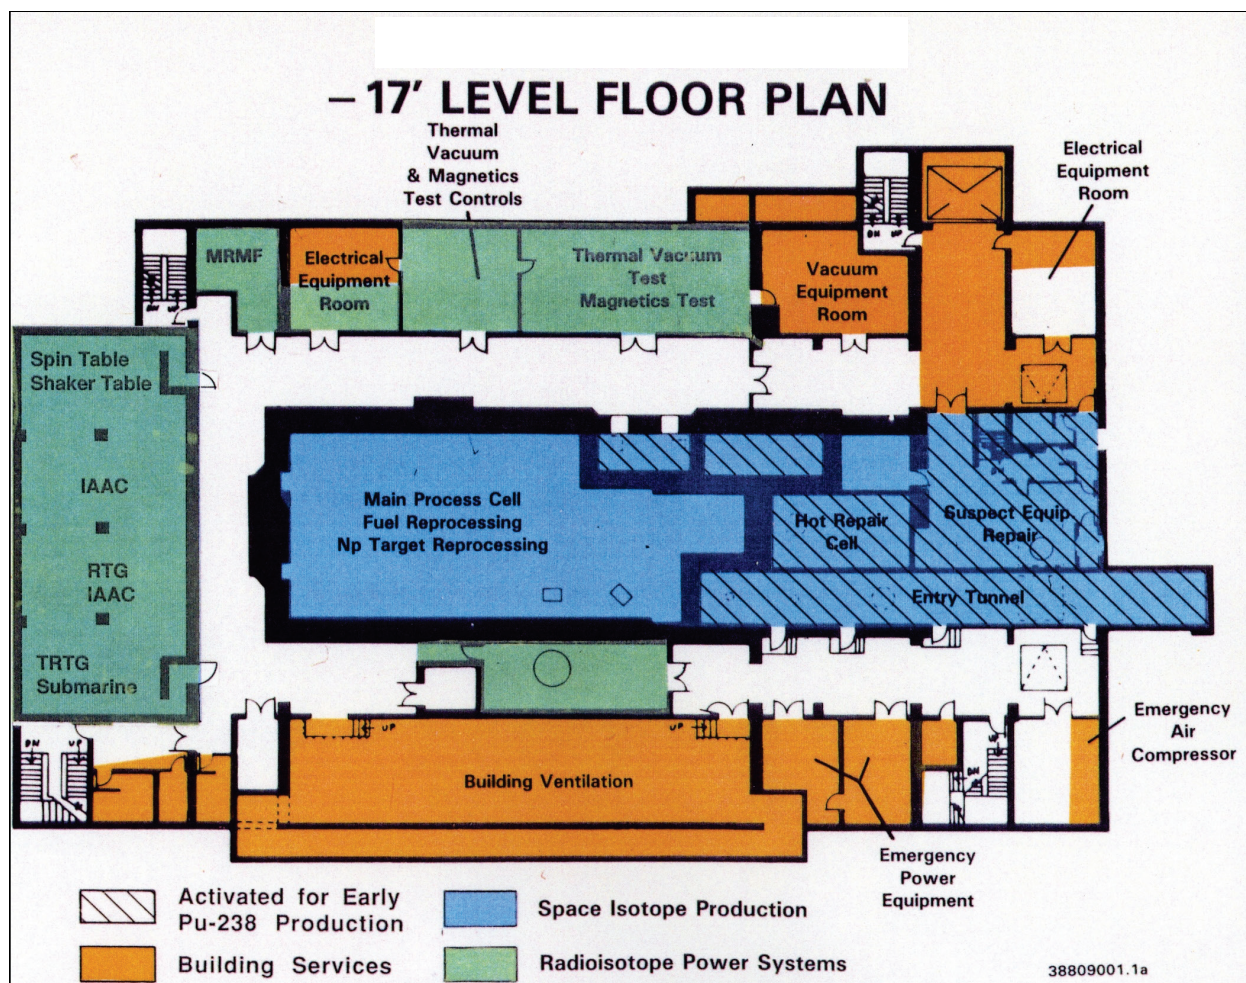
FMEF Process Building, –17 Foot Level Floor Plan. Note: Floor plan as laid out for the Radioisotope Thermal Generator Mission
